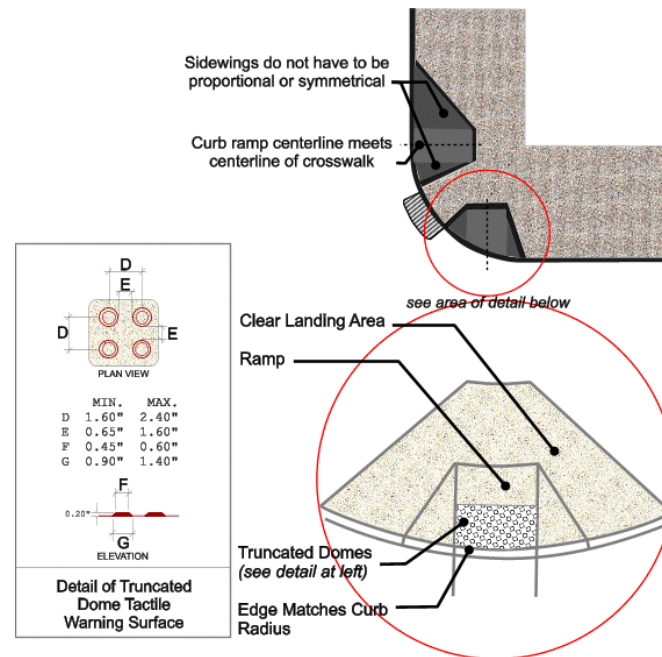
Detail of an ADA-compliant curb ramp design with truncated dome measurements.
